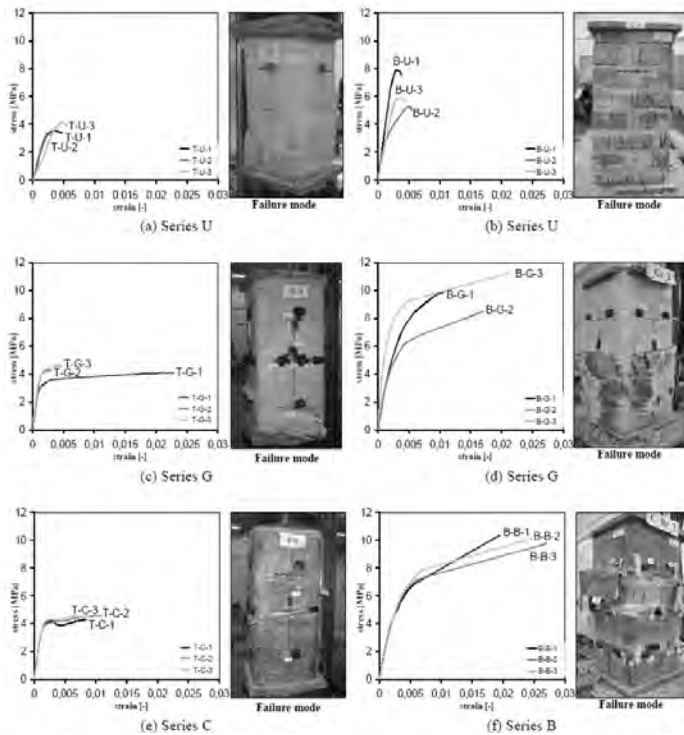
Stress-axial strain relationships and specimens' failure mode: (a),(c) and (e) tuff masonry; (b),(d) and (f) clay brick masonry.
